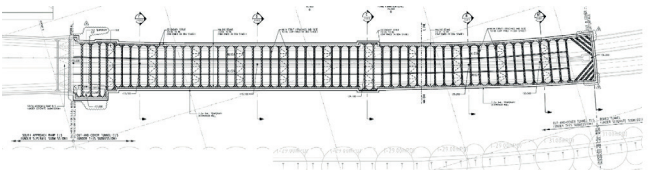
Conventional ELS scheme (plan and longitudinal section) with straight D-wall and steel struts
